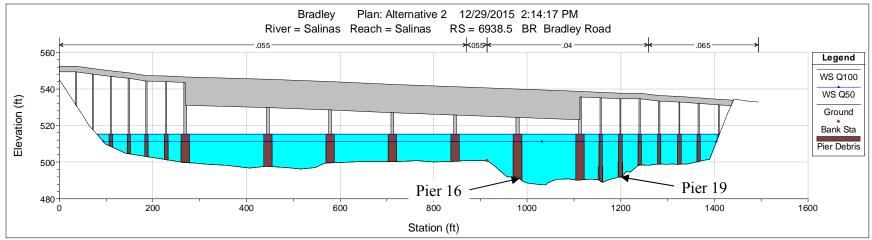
Upstream Face of Proposed Alternative 2 Bridge, Looking Downstream (Northwest)
